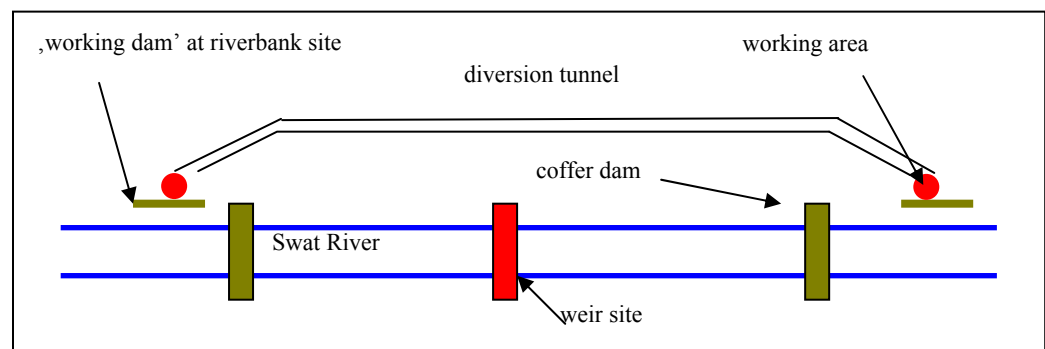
Construction scheme for drilling of the diversion tunnel
